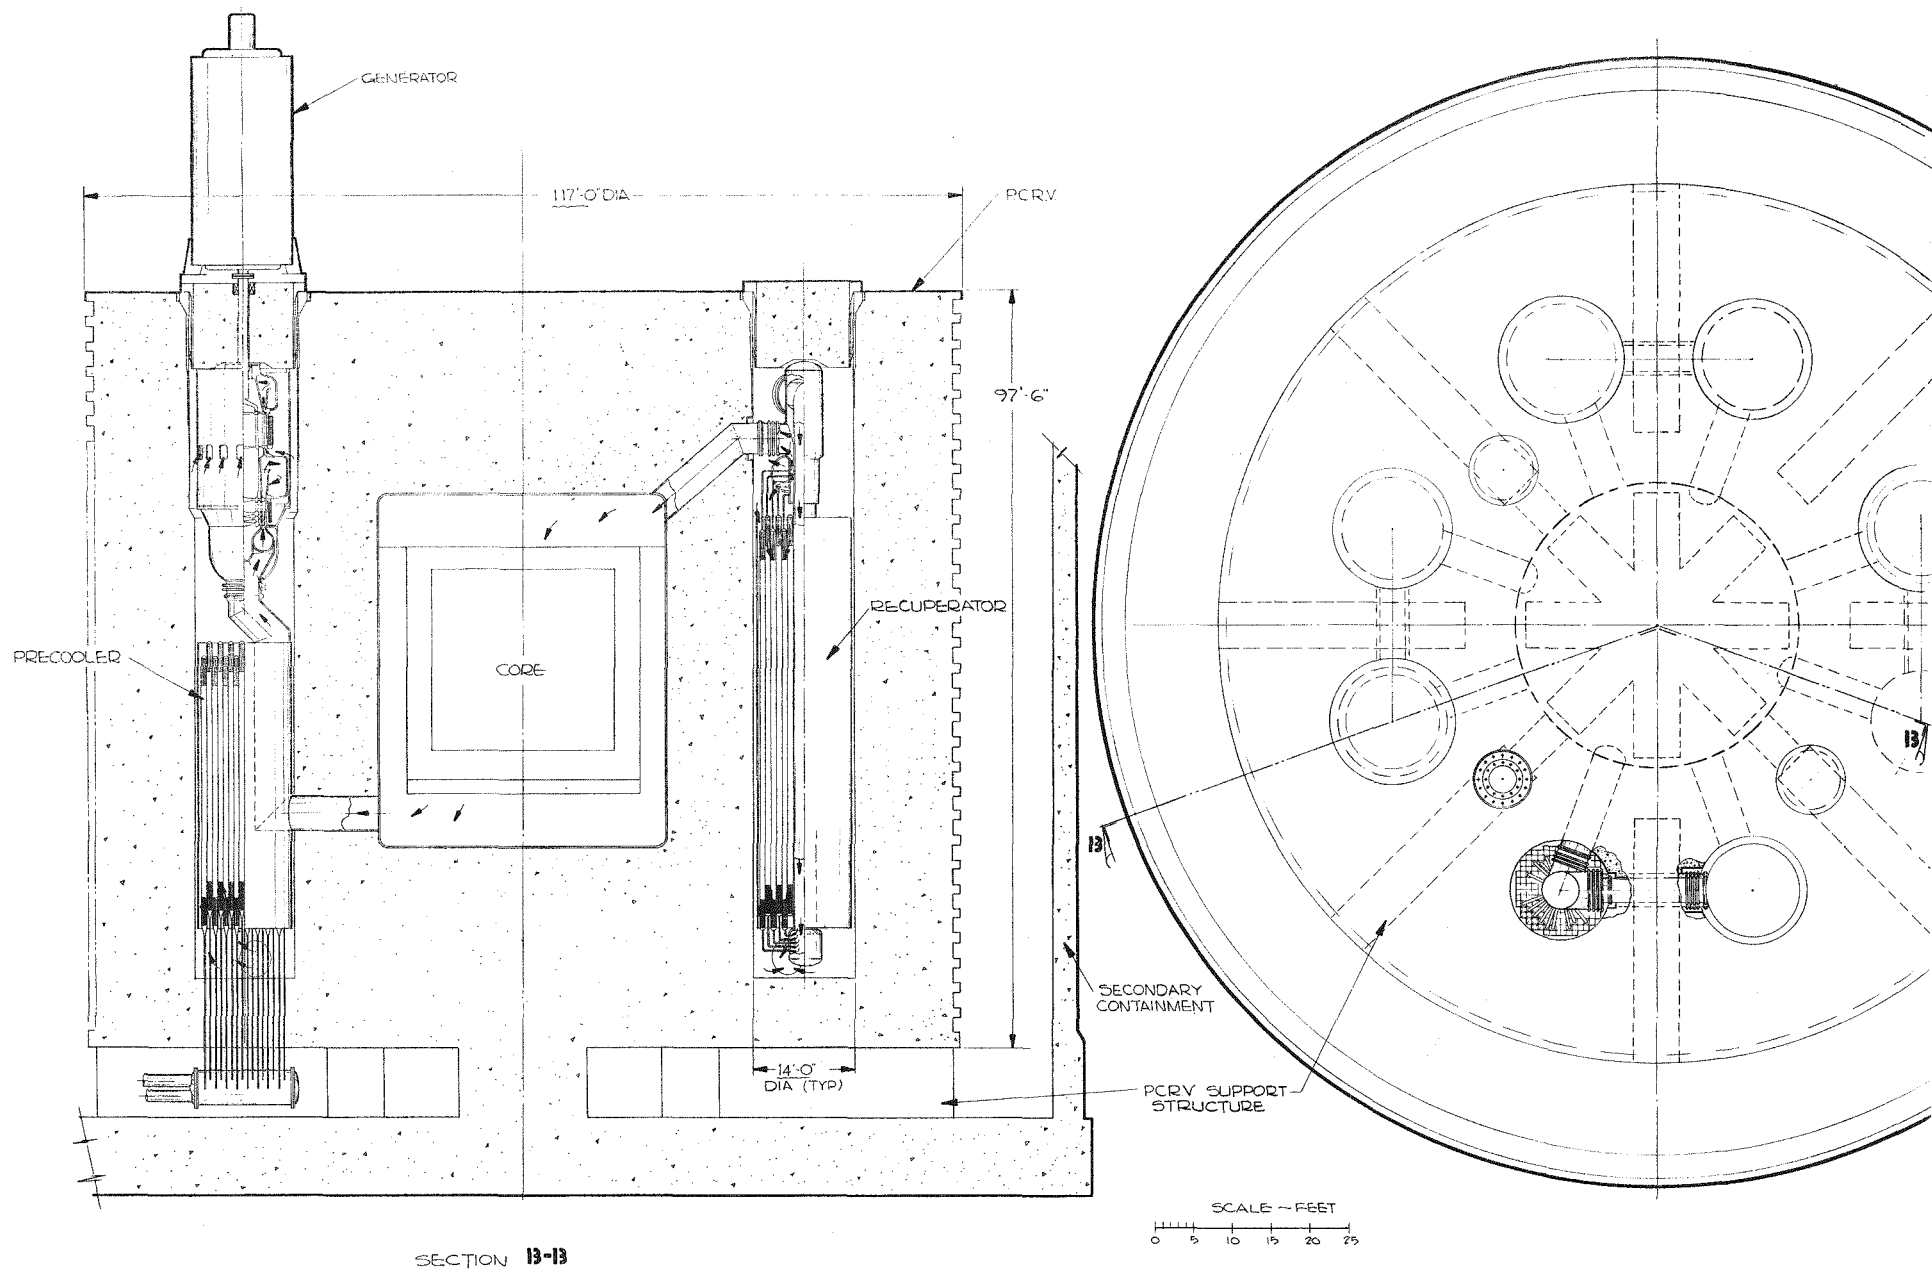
Plant Configuration 2. Showing Single-Shaft Turbomachinery and Vertical Generator.
